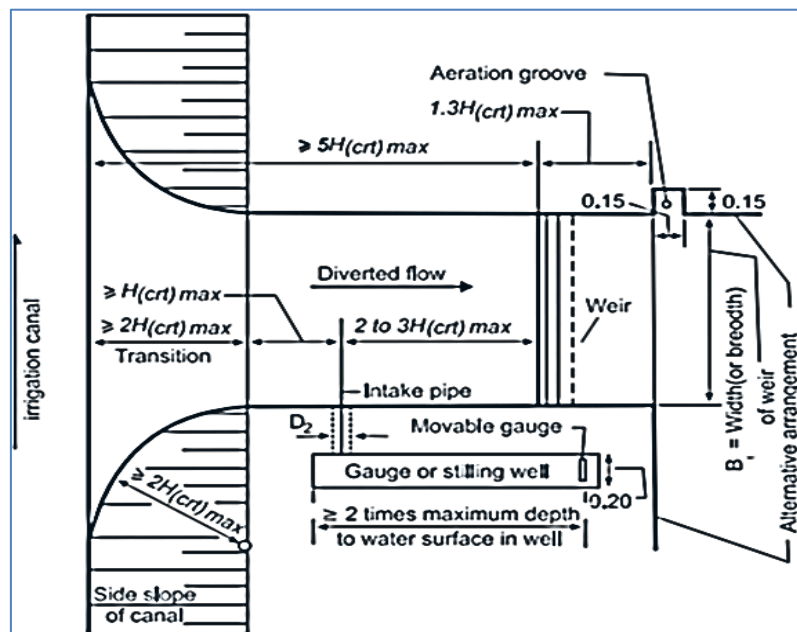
Romijn broad-crested weir hydraulic dimensions of weir abutments
